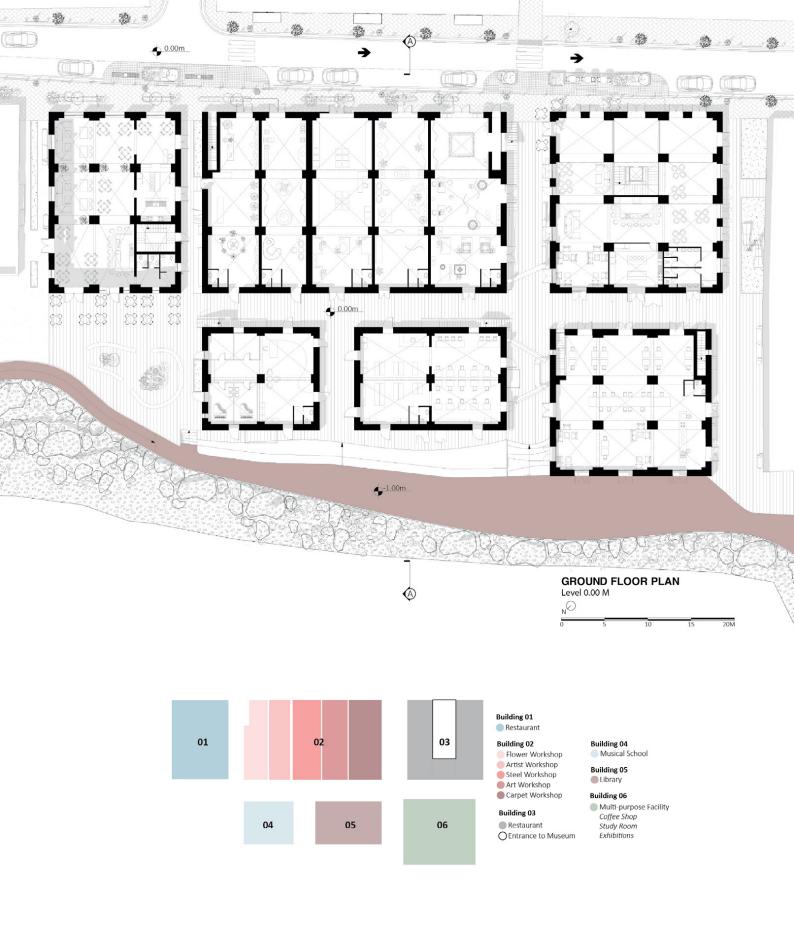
Ground Floor Plan of The Selected Historical Buildings, Illustrating Adaptive Reuse Strategy , and Highlighting Their New Functions (N.Maawad, A.Khoury)
